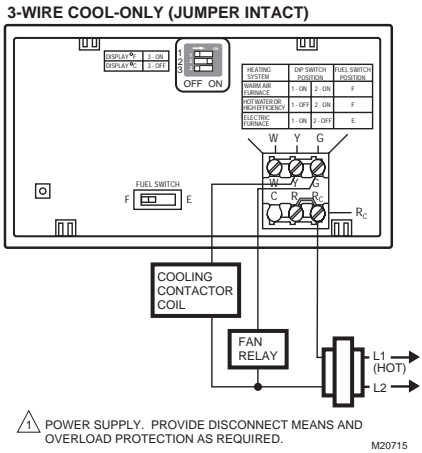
Typical hookup in three wire cool only (jumper intact) application.
